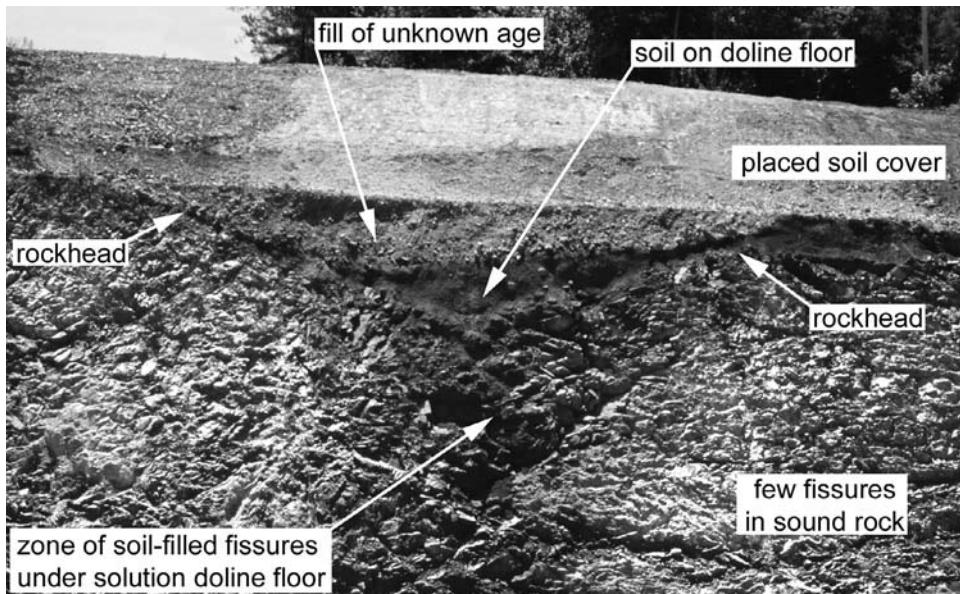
A fresh road cut in limestone karst in eastern Korea that sections a shallow filled solution doline, with a zone of widened and soil-filled fissures diminishing with depth beneath its floor; the face in the image is about 15 m wide and 8 m high.
